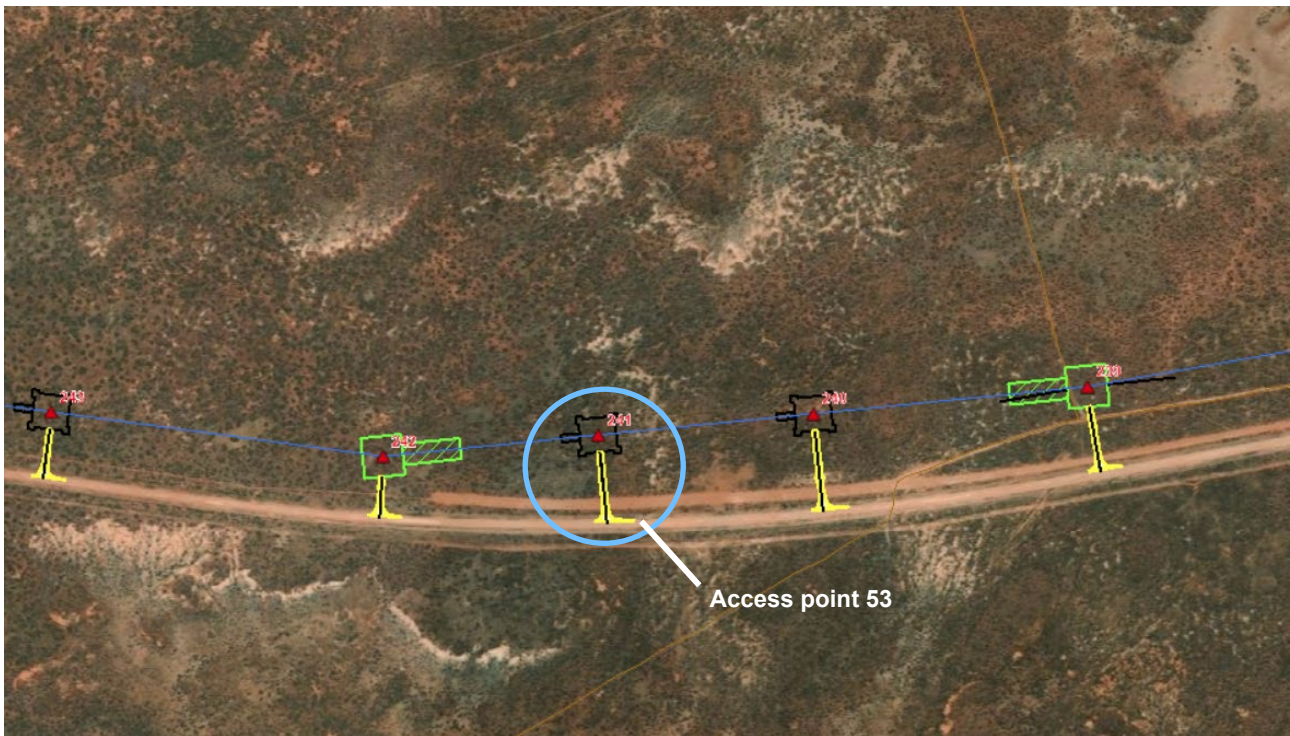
Access point 53 (Renmark Road, tower 241)
